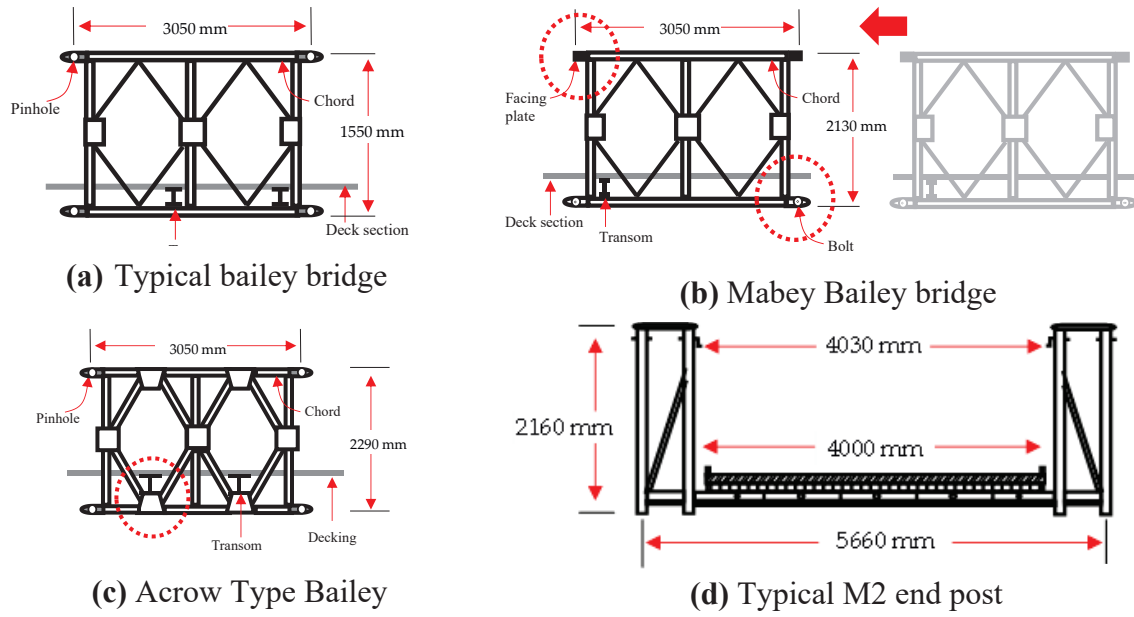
Typical Bailey Bridge Structural Characteristics
